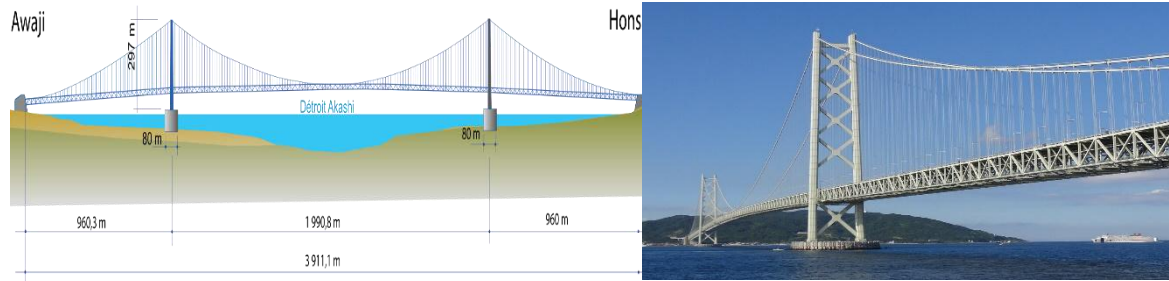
, 1.2- Akashi Kaikyo Bridge [141]
